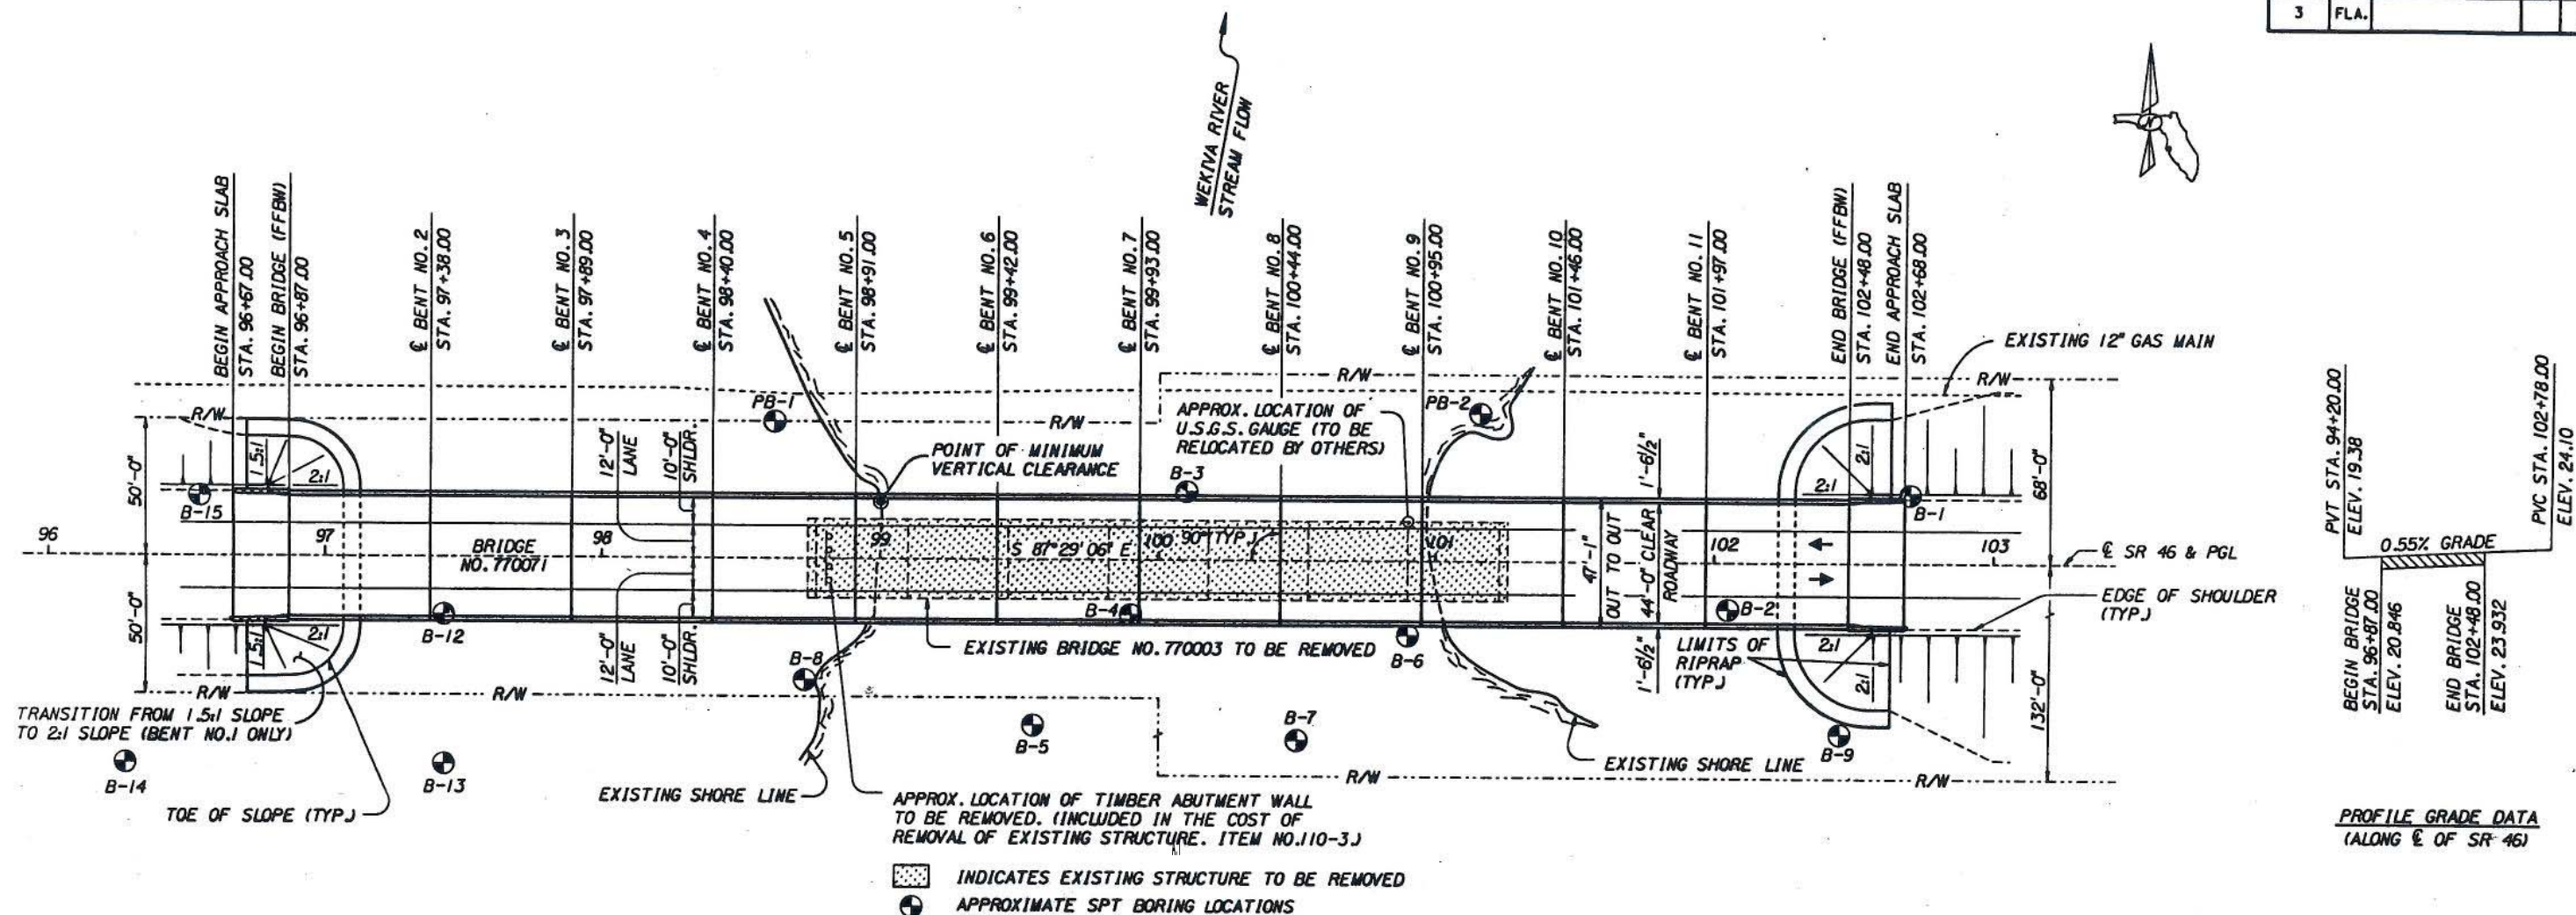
shows the plan and elevation of the existing SR 46 bridge over Wekiva River. The existing bridge is a standard, functional pre-stressed concrete stringer/girder structure. There are no embellishments or aesthetic treatments on the structure. The bridge measures 561 feet in length and has eleven 51-foot spans. It carries two lanes of traffic, one in each direction and has no sidewalks. The total width of the bridge deck is 47 feet. The bridge has concrete traffic barriers along each side, with chain link fencing mounted on top.
